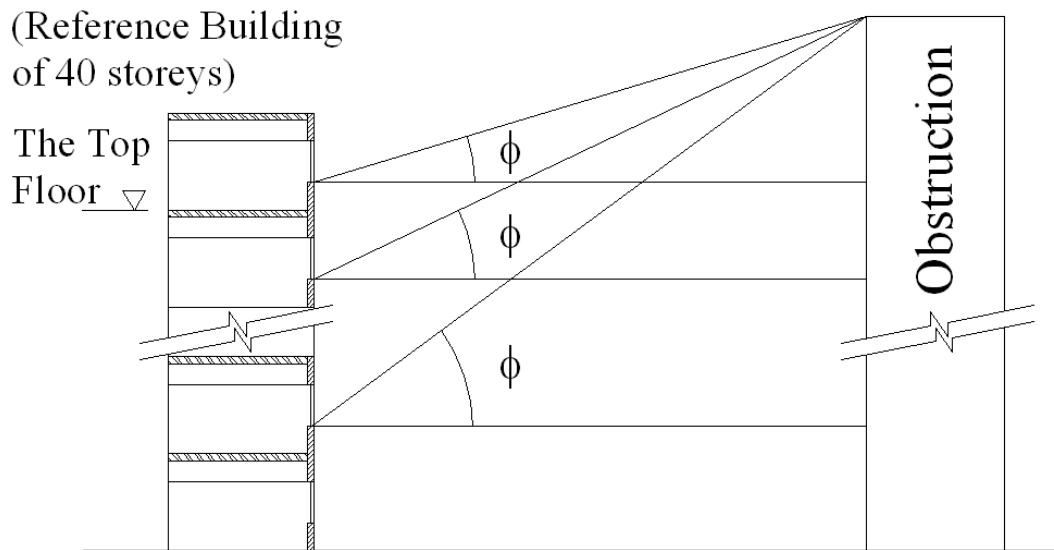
The angle between window sill for individual floors and the obstructing block (ϕ)
